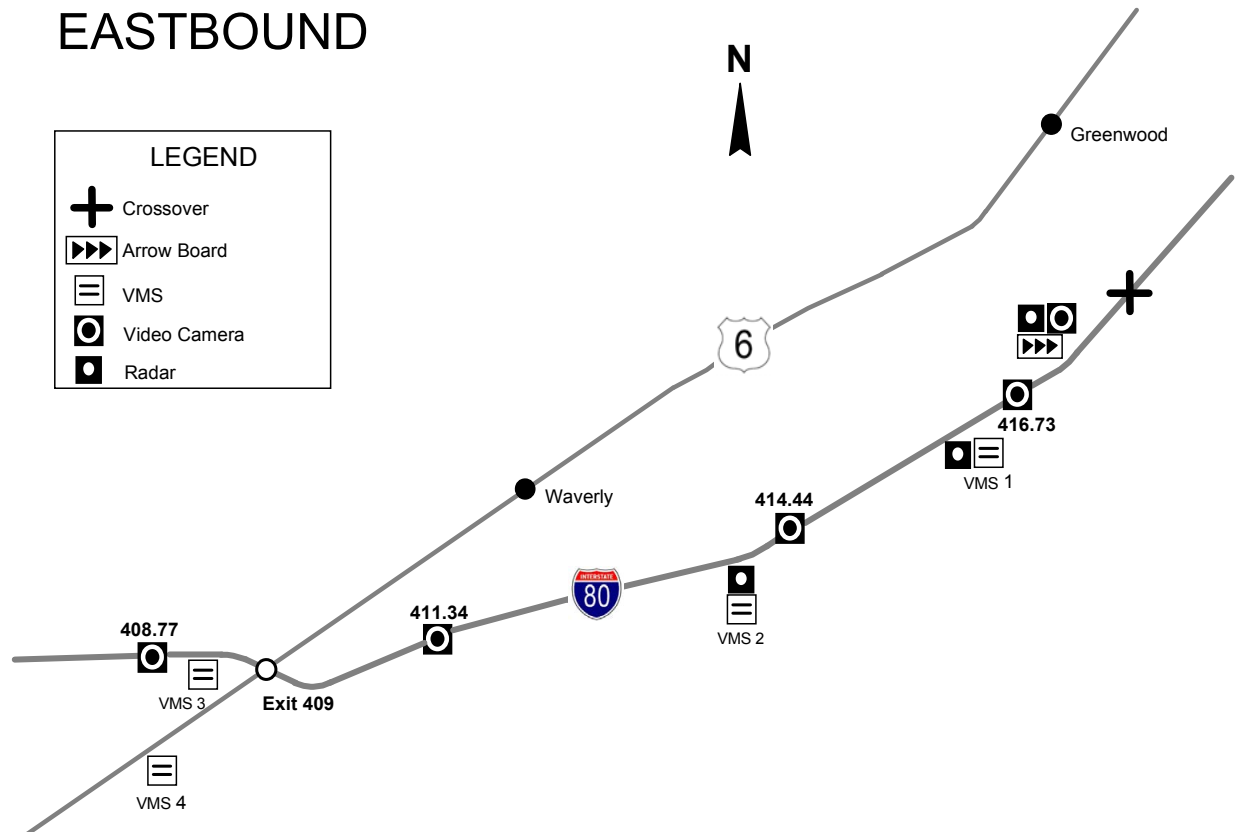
Traffic control plan at ADAPTIR study site.
